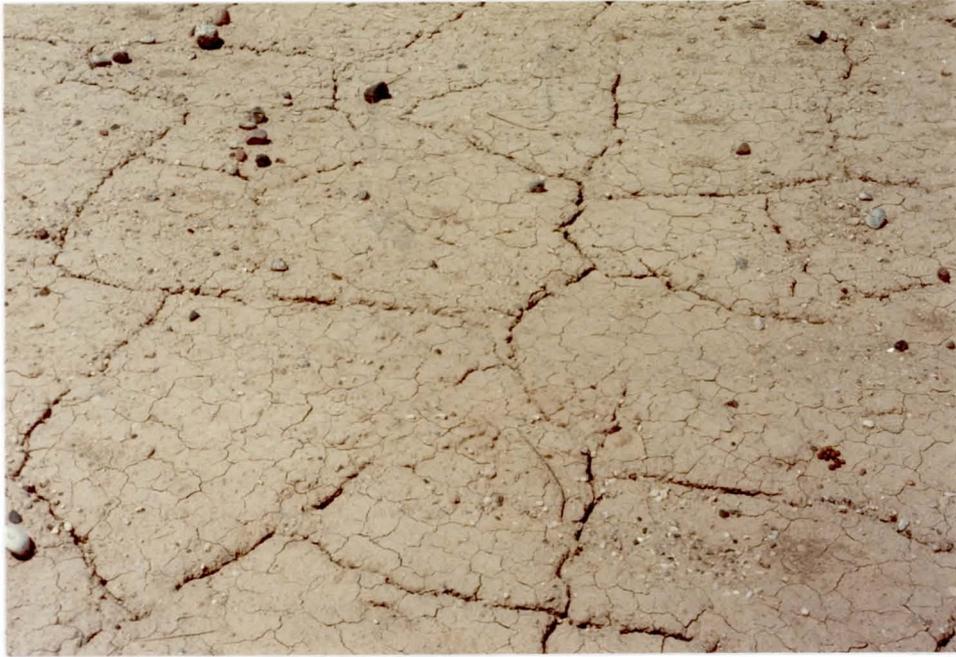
Shows typical cracking pattern in earth liner - just downstream of Sta 1250 + 00
